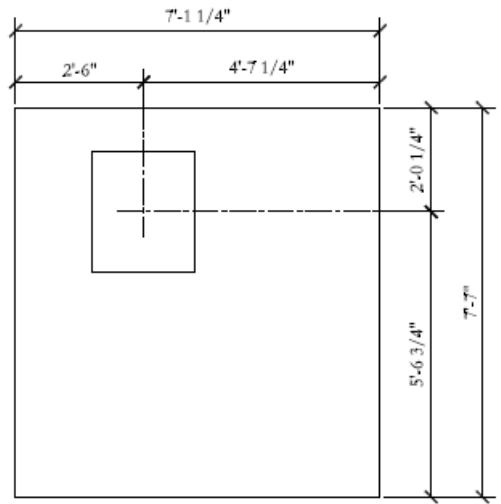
Proposed Concrete Structural System Pile Cap Configurations
